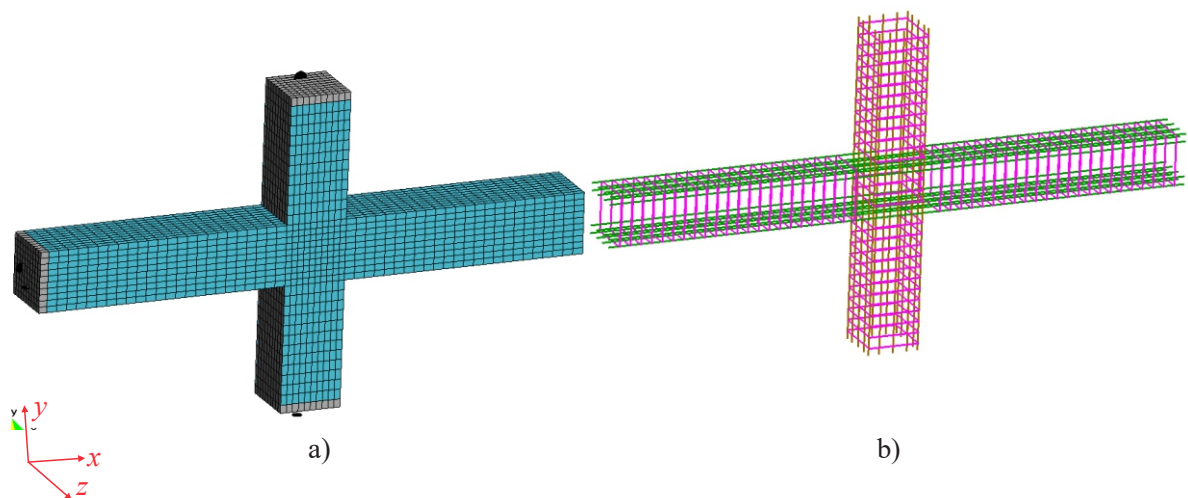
Finite element discretization a) Concrete b) Reinforcement.
